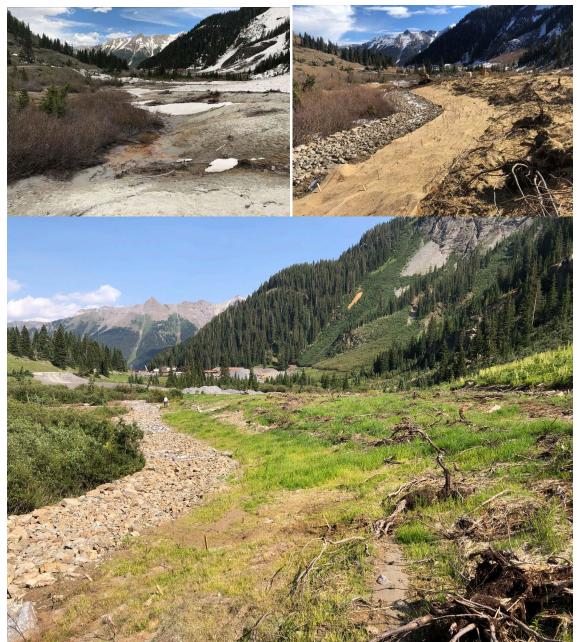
Conditions at grey tailings preconstruction showing toe of slope (left) and after construction (right) showing run-off channel and reclaimed slope, and bottom center 1 year post construction.
